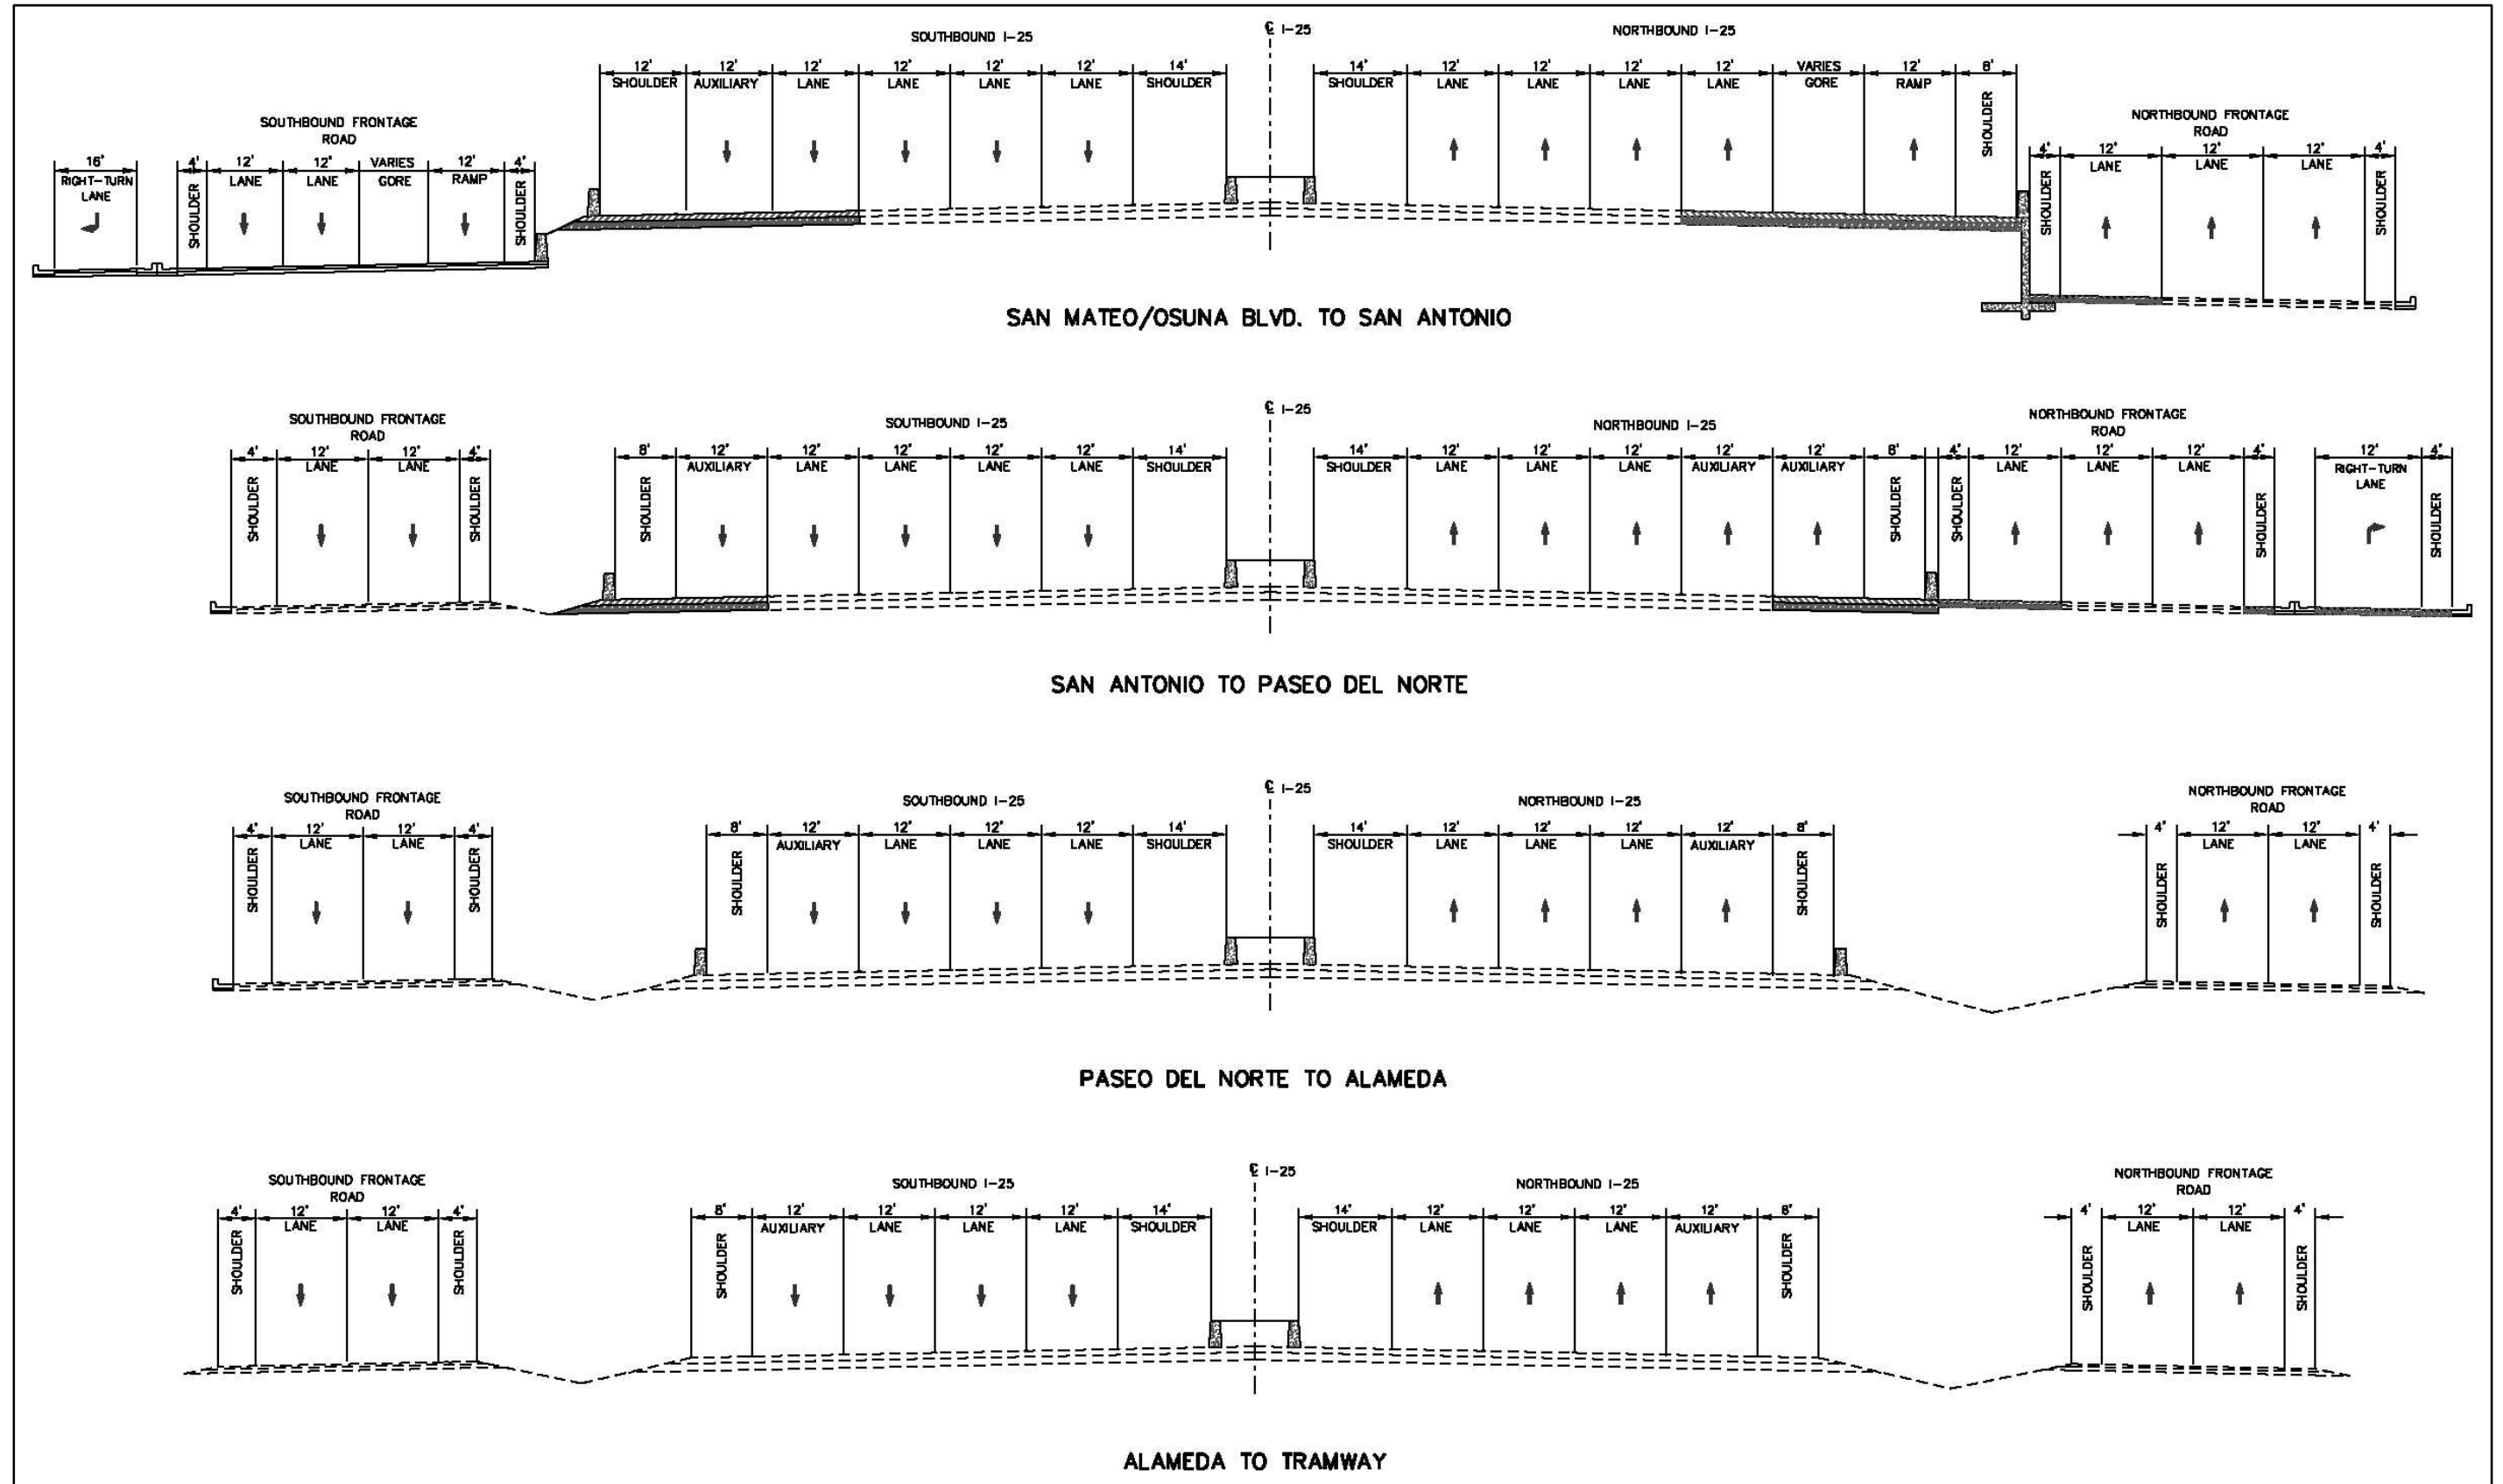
, Build Alternative 3 Typical Sections (continued)
